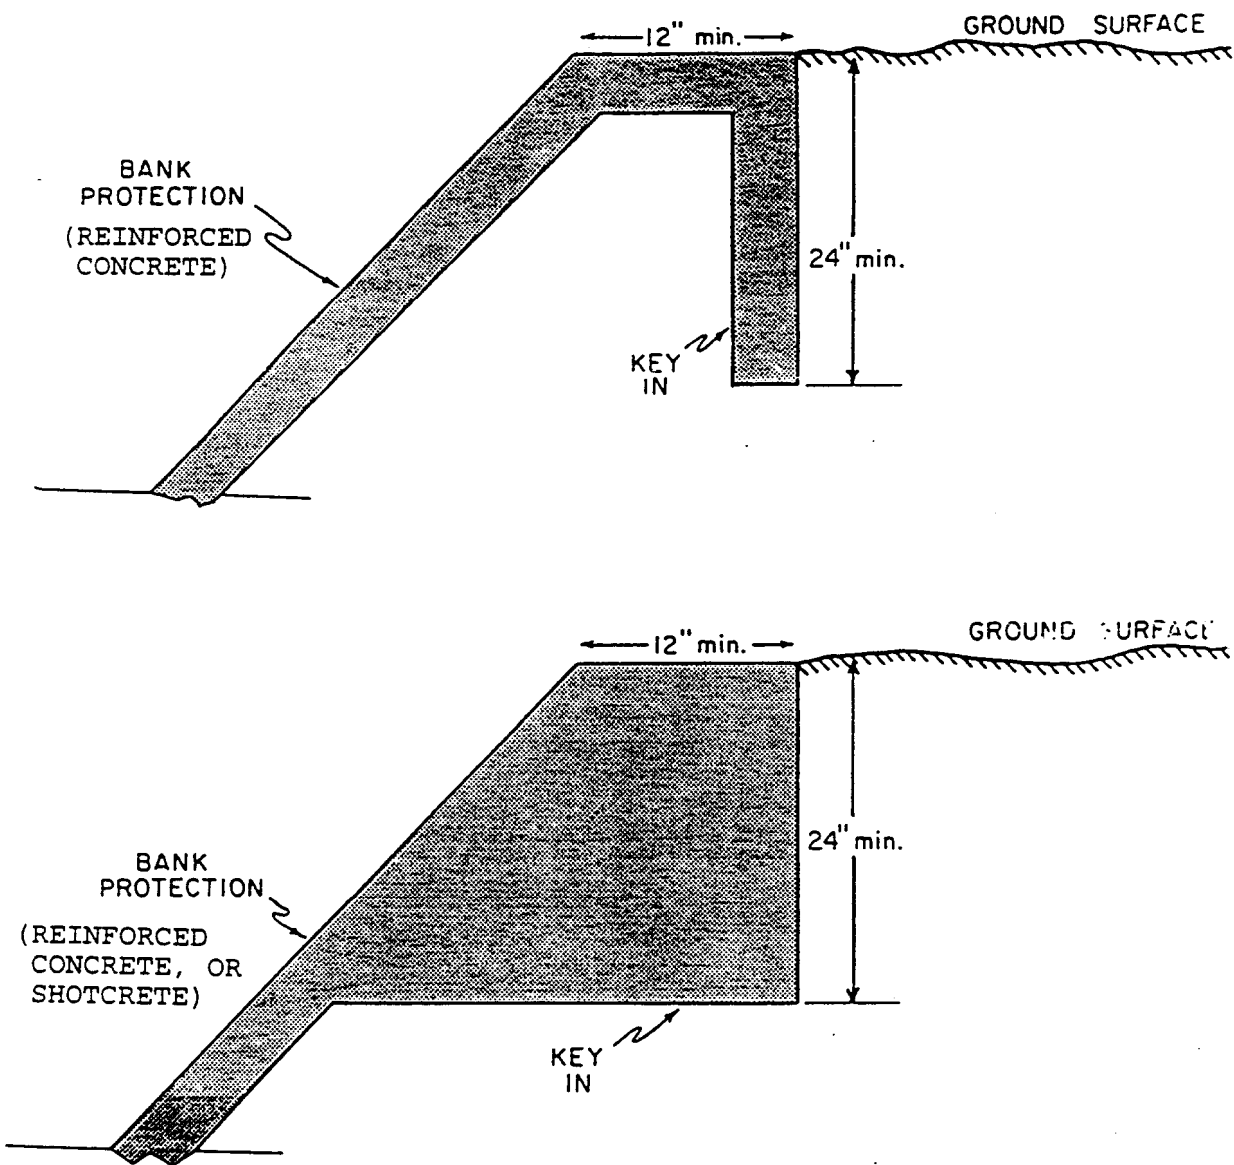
Concrete Lined Channels: Typical Key-Ins
